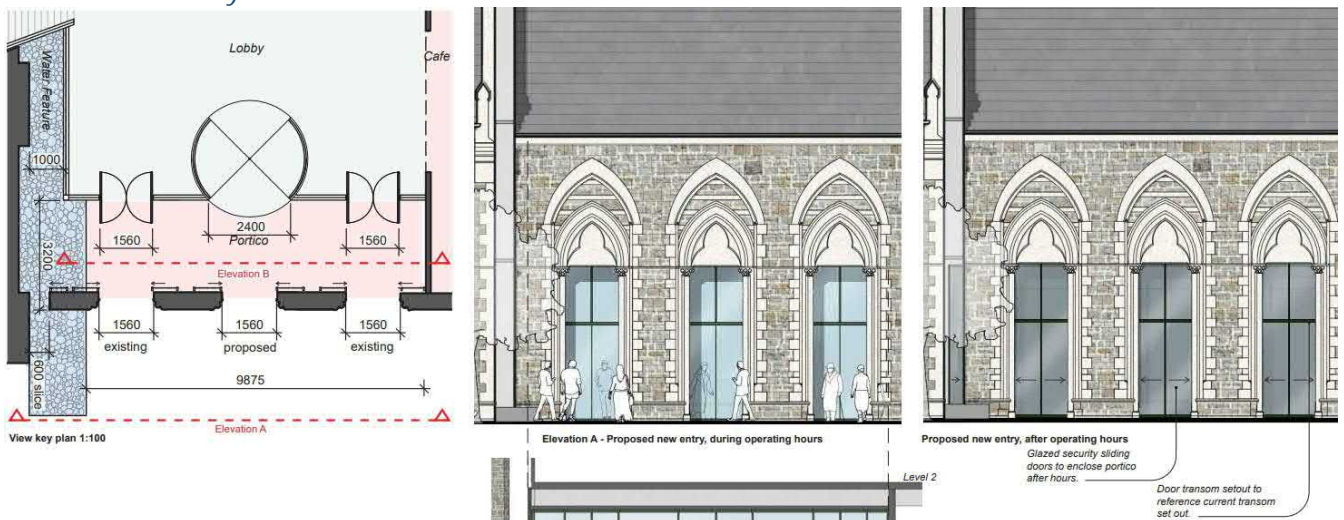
Proposed east elevation of the Centennial Wing (off Rolleston Avenue)
